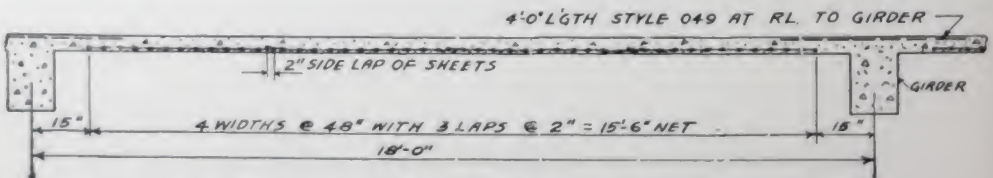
Section through girder and slabs showing typical mesh design for slabs.
